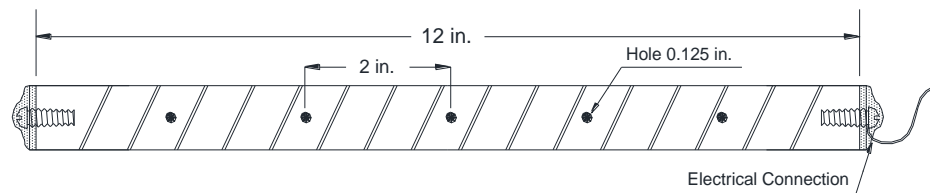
Damage pattern of epoxy-coated bar (plan view) in bench-scale tests
